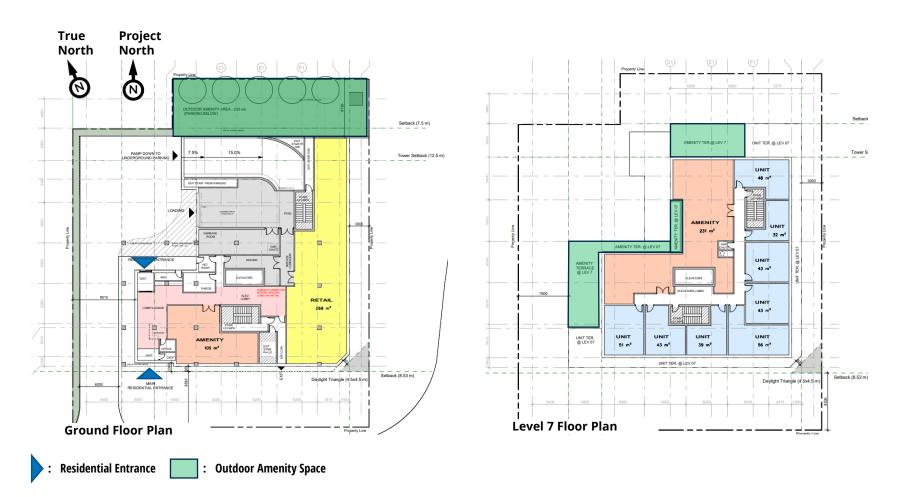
Floor Plans of the Proposed Project (Courtesy of Kirkor Architects and Planners)
